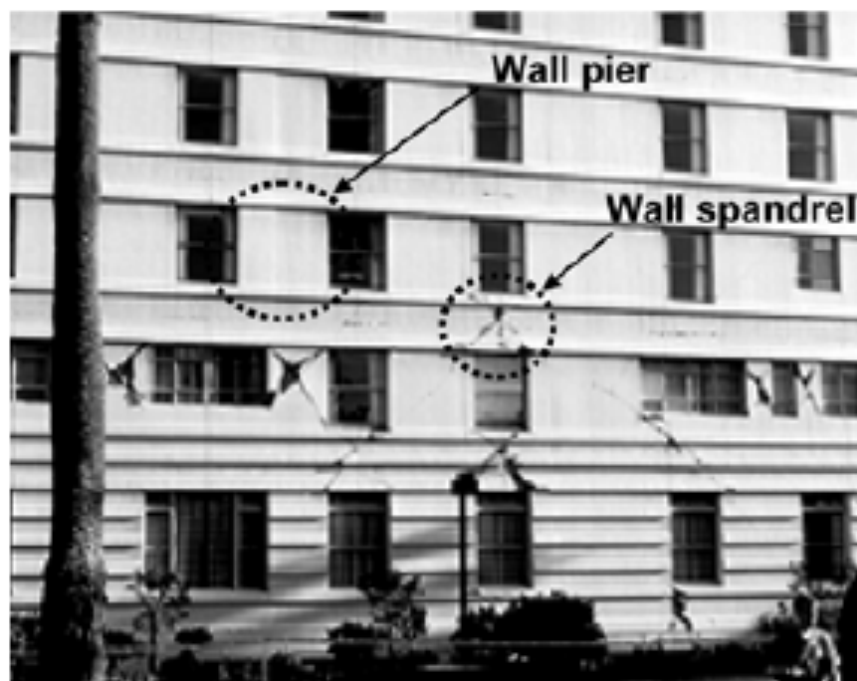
Wall Piers and Spandrels in a Perimeter-wall building (Massone, 2006).
